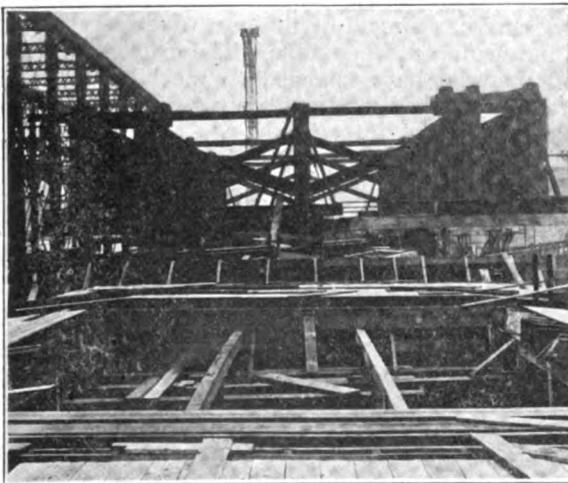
At Clark Street Space Is Left for the Street, Which Is Not Yet Raised to New Level.
